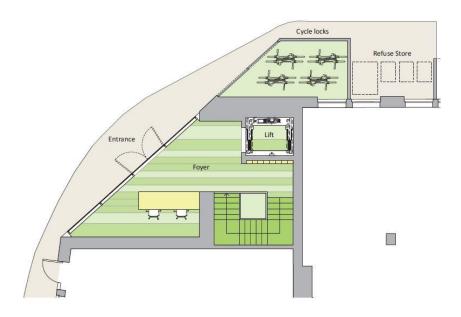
Layout of the Proposed Ground Floor Residential Entrance
